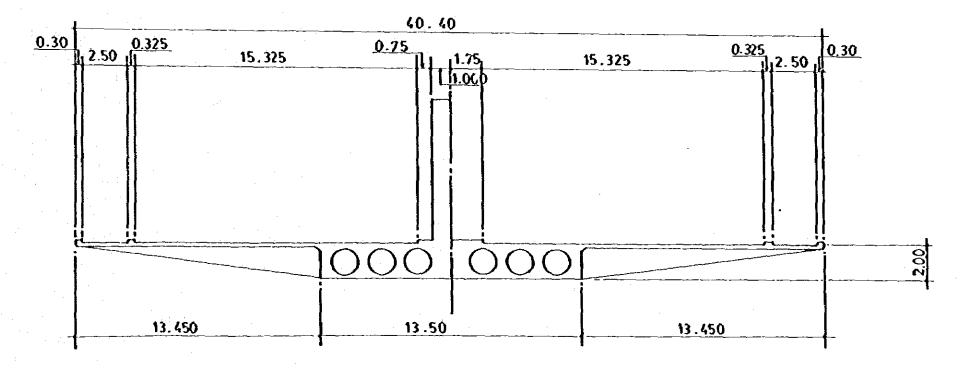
CROSS SECTION OF CONCRETE SAIL BRIDGE
